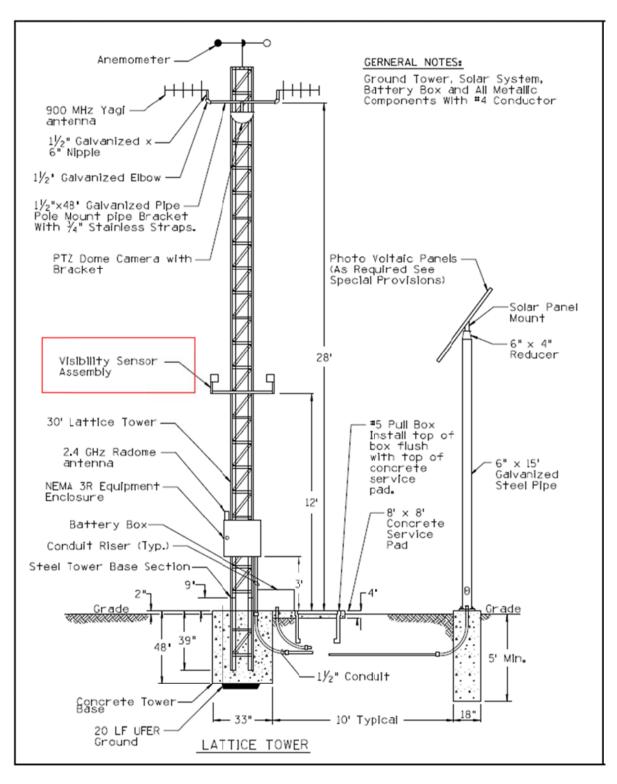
Schematic of the Safford District DUST Tower Installations (Source: ADOT)
